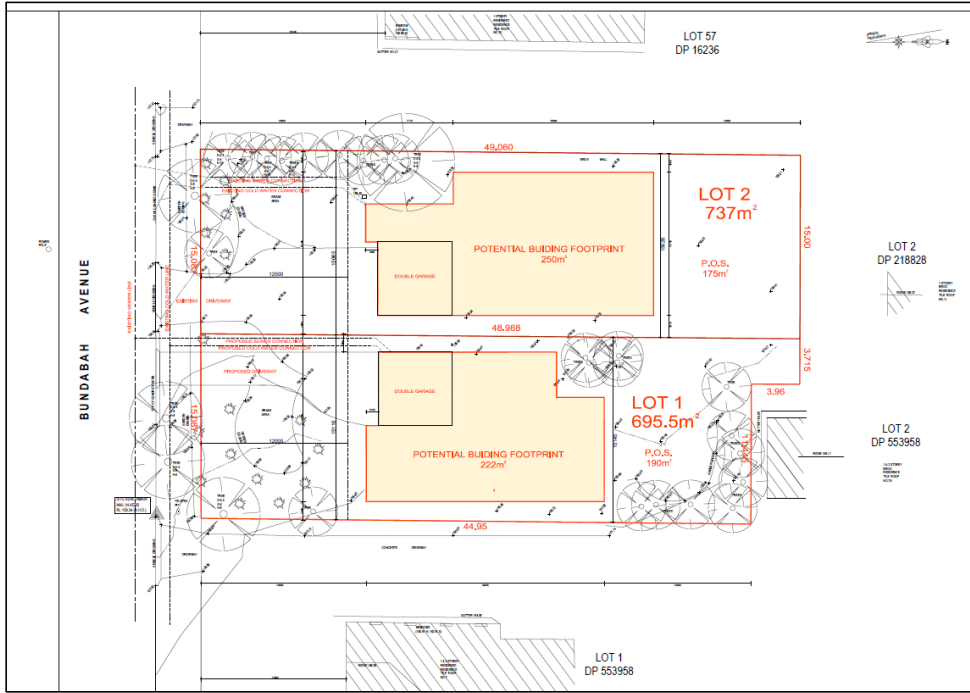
Proposed subdivision plan (Corona Projects, 2025)
